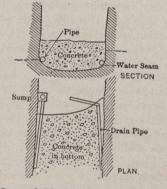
Second Method of Handling Water in Core-Wall Ditch.
